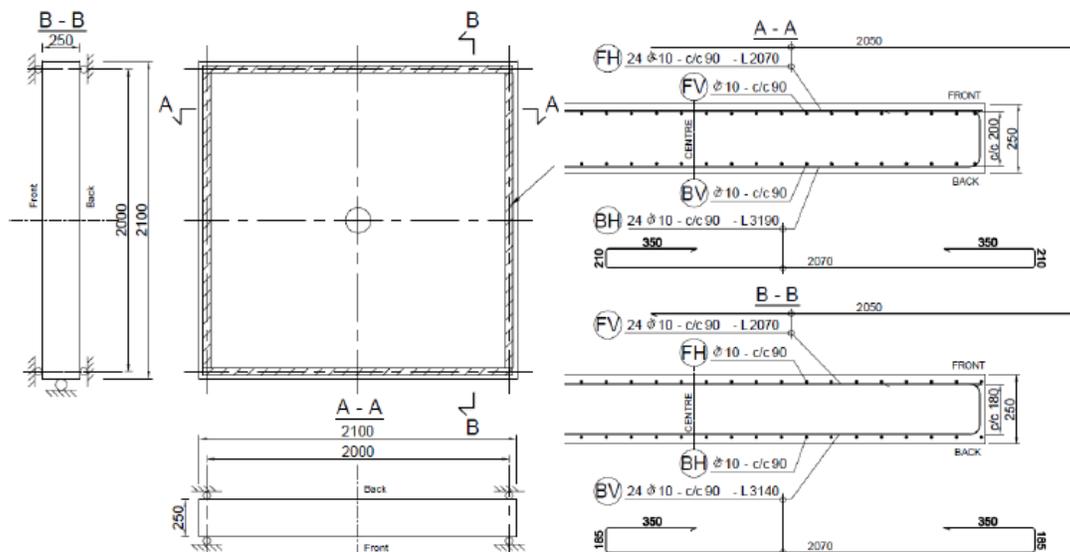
Baseline reinforced concrete specimen and reinforcement details
